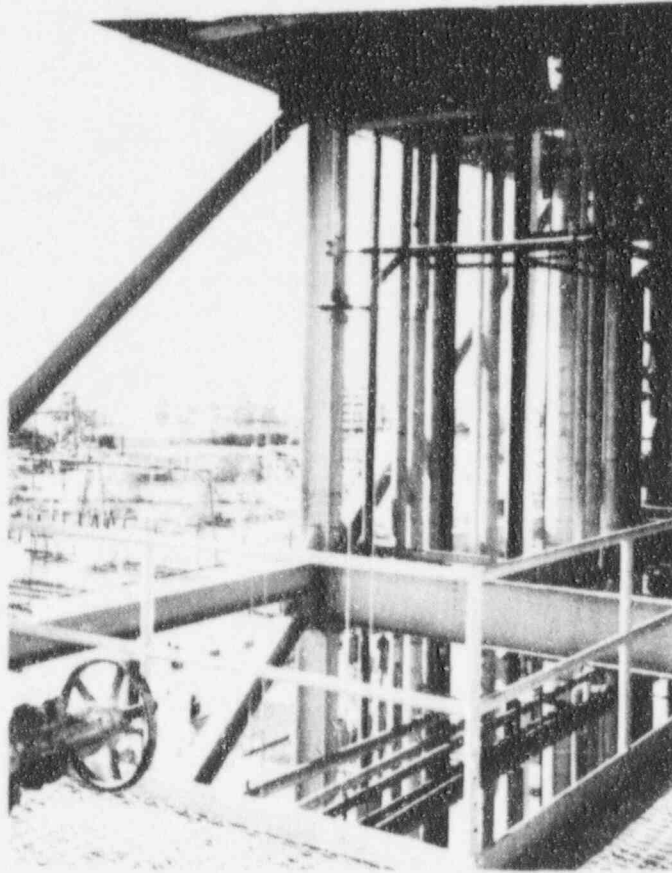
Structural Steel Framing for Valley Unit 3 Showing Diagonal Vertical Bracing
